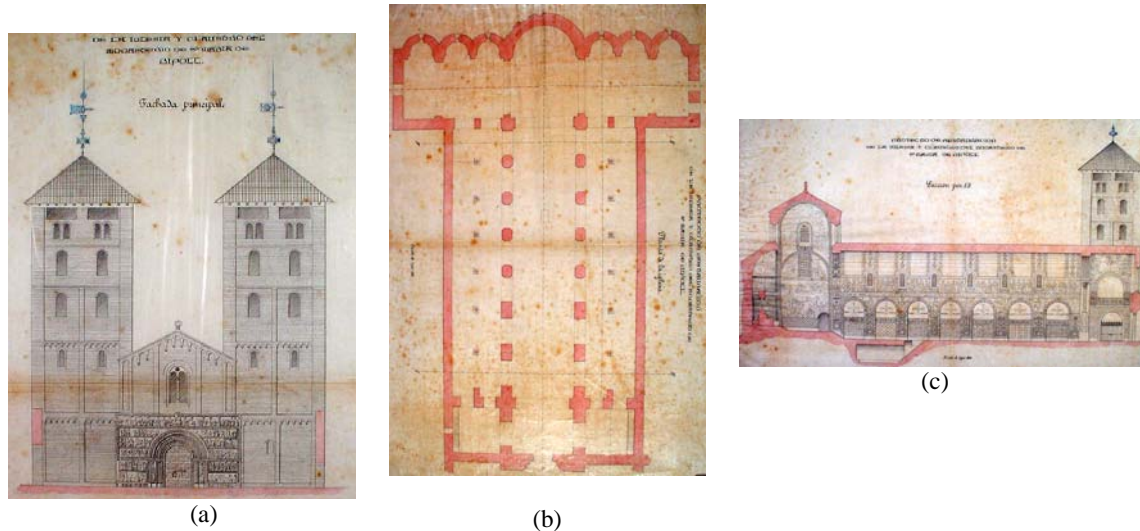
Geometry: (a) façade; (b) plan; (c) cross-section
